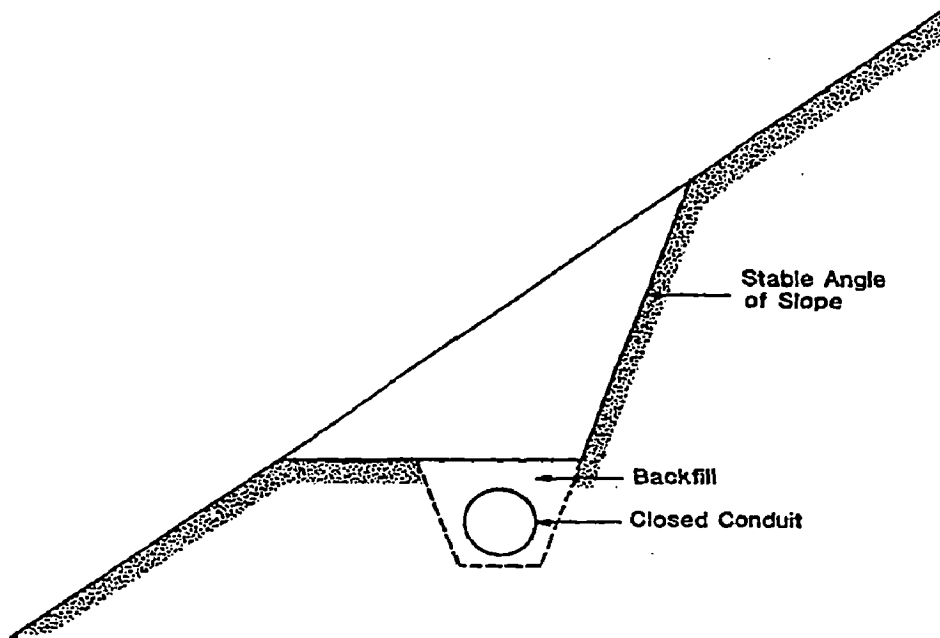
RECOMMENDED DESIGN FOR CLOSED CONDUIT HEADRACE PIPE
